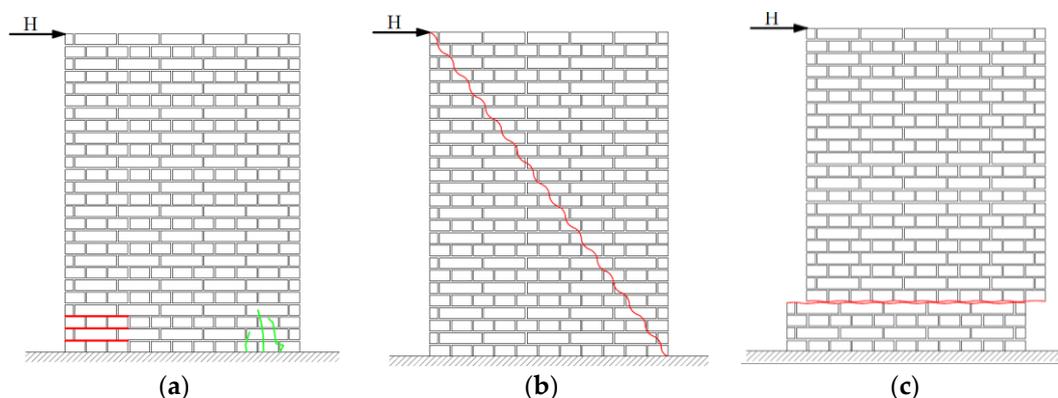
In-plane failure modes of unreinforced masonry walls/piers—(a) flexural failure. (b) Diagonal shear failure—straight or stair-step pattern. (c) Sliding shear failure.
